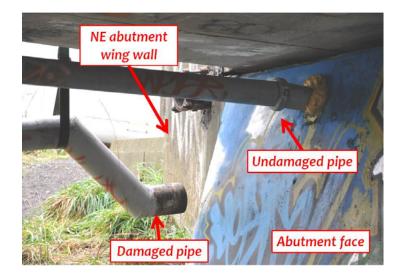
Below the East end of the Kainga road bridge (looking northeast). (-43.3998°, 172.6914°).
